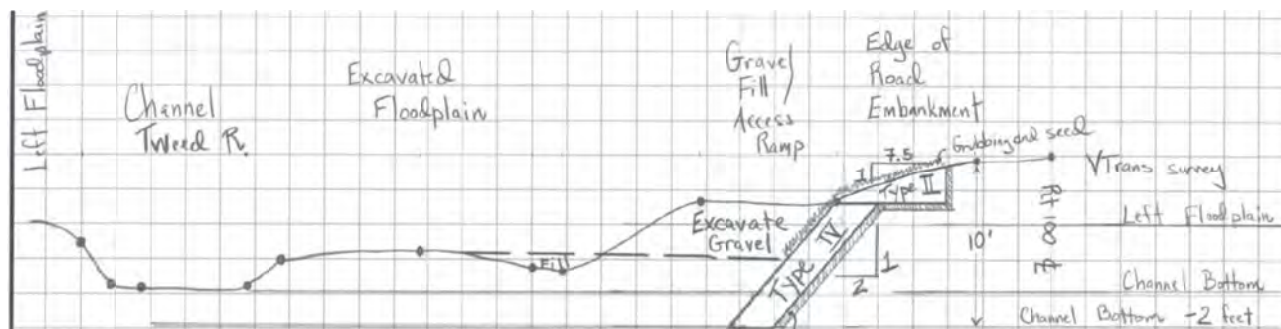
Sketch plan showing placement of road embankment armor along Vermont Route 100 rather than along dredged gravel. (Source: Milone & MacBroom, Inc.)
